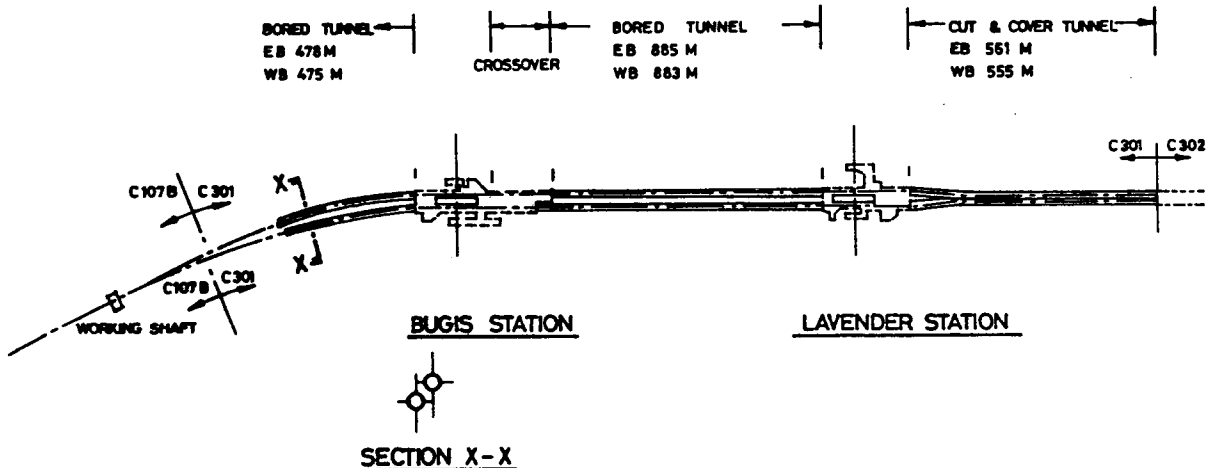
CONTRACT 301 - TUNNELS - LAYOUT PLAN
